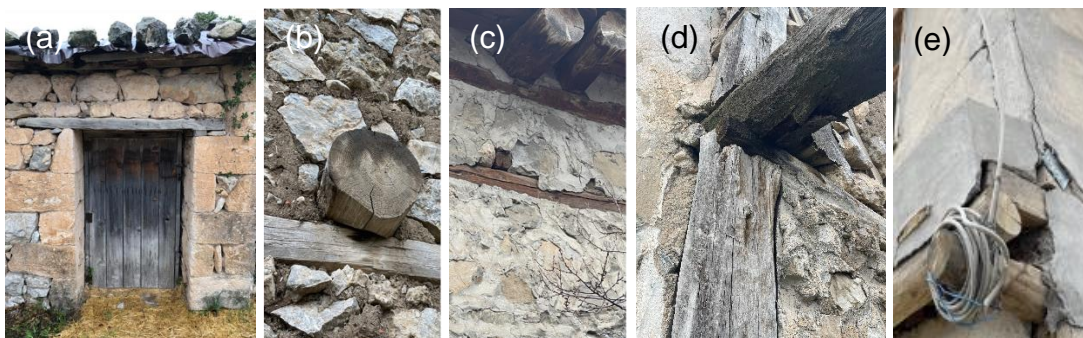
a) Timber lintel support, b) Joist resting on the wall plate, c) Tie-beams running along the wall at the floor level, d) Inadequate joint between vertical post and tie-beam, e) Lack of connection between perpendicular tie-beams.
